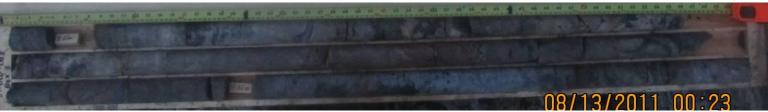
Core Box #3 of 9 (Runs 4-6, 8.5m - 12.6m)
